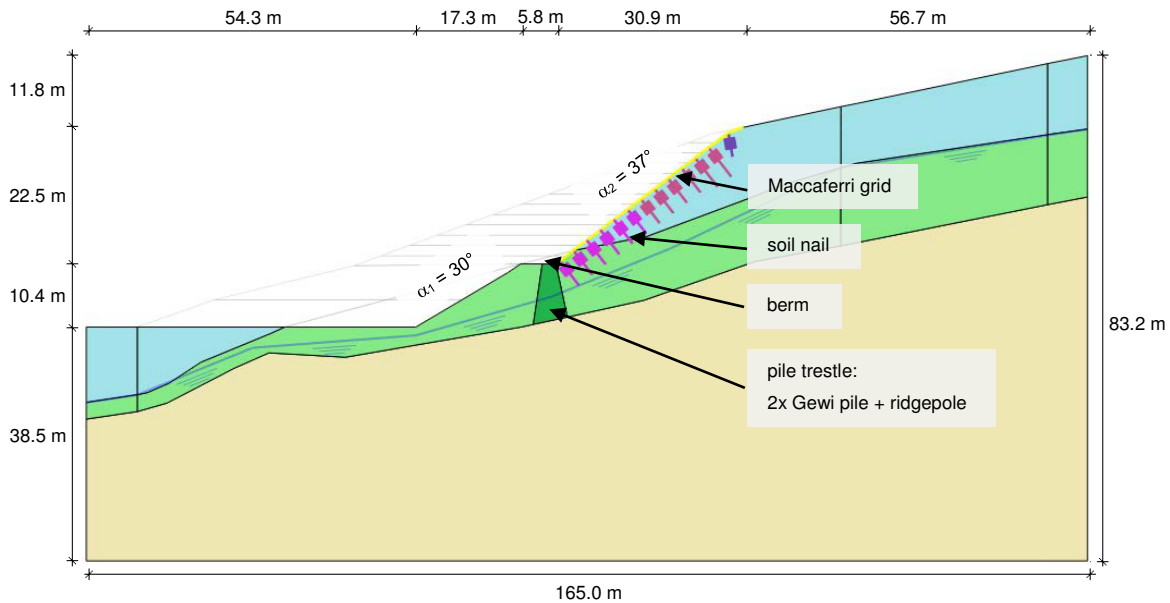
Upstream slope - case 1: Dimensions and structural elements
